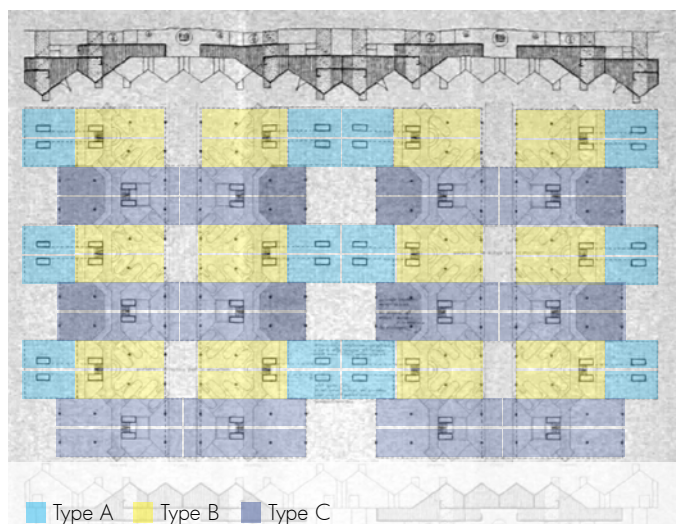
Floor plan, De Kasbah [source: Hidden Architecture, 2013]
